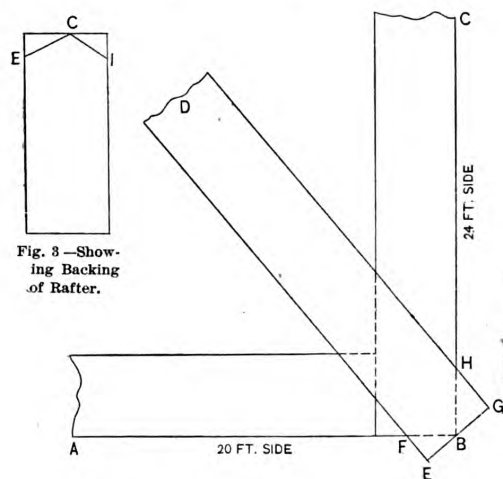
Plan of Rafter and Plates at Corner of Building.
